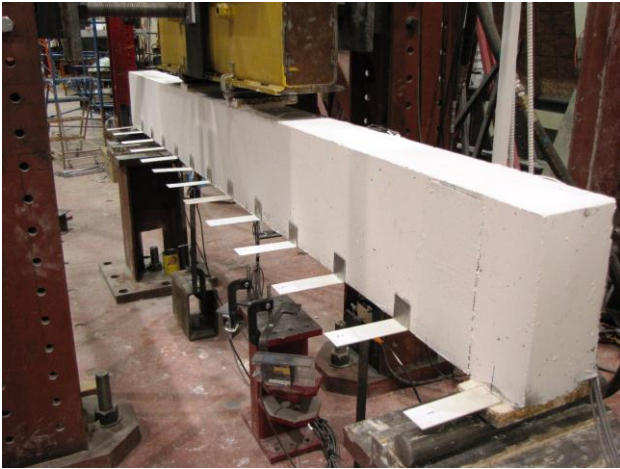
Concrete beam to be used for the experiment (placed underneath the spreader beam)
